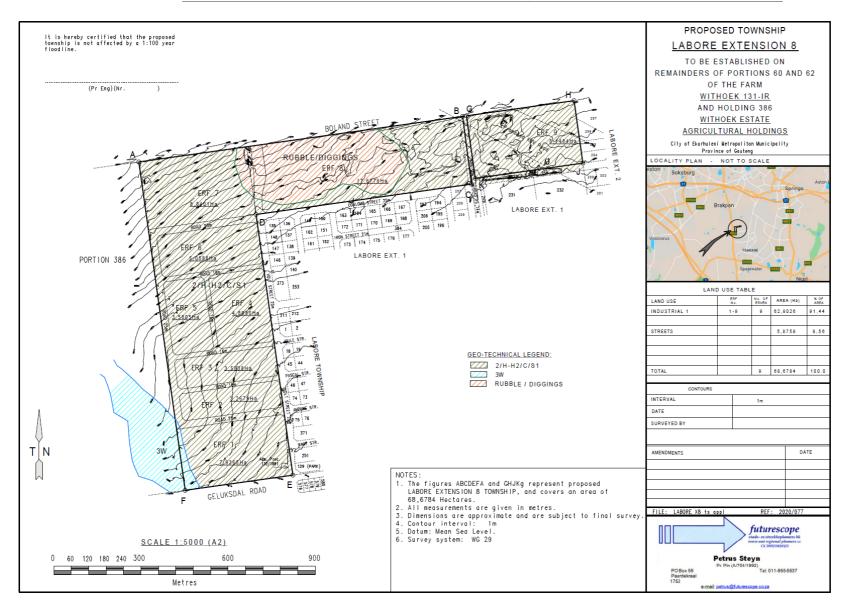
Layout Alternative 1: Preliminary Layout Plan
